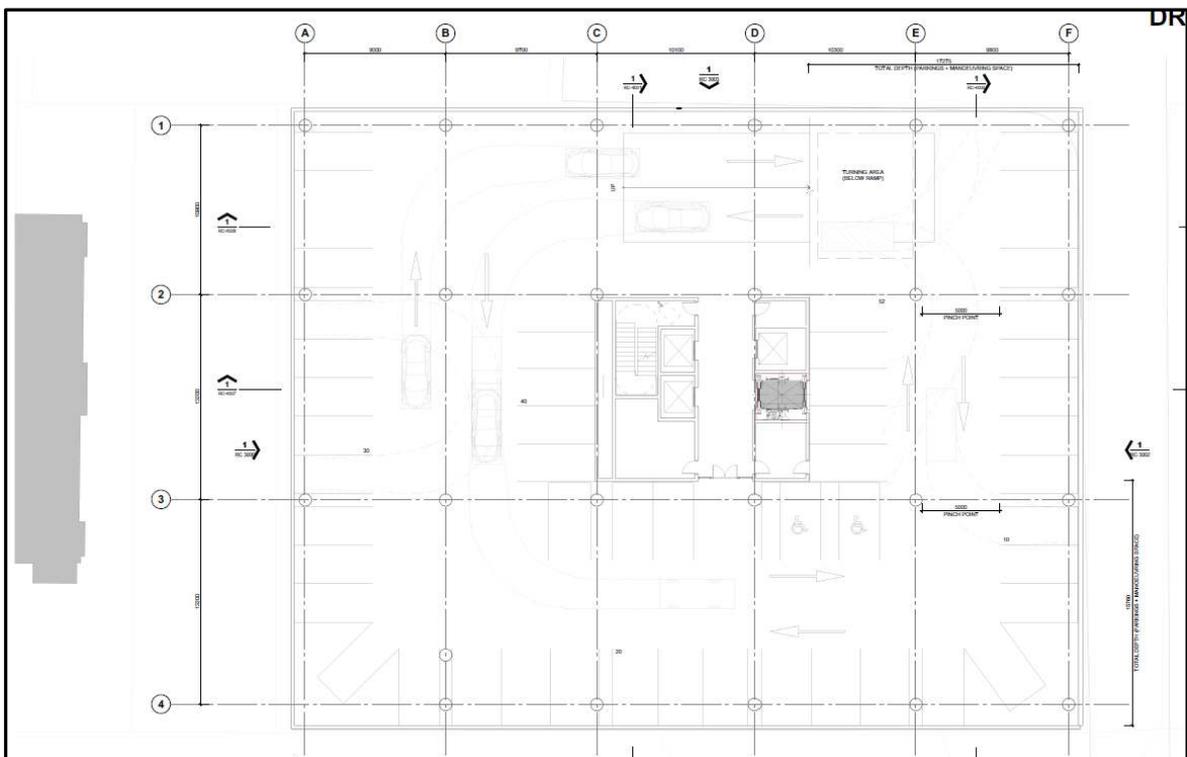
Basement Floor Layout (Source: Jasmax Architects)
